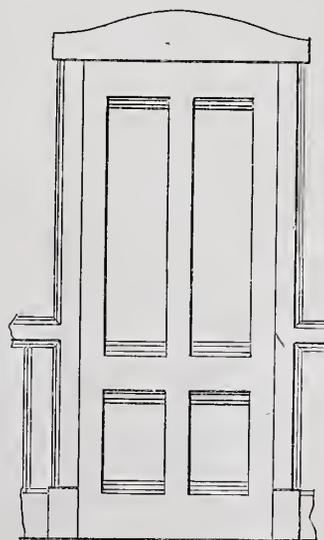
Elevation of Kitchen Door Showing Wainscoting.—Scale, 3/8 Inch to the Foot.
